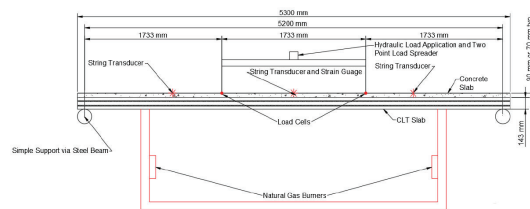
A typical TCC floor assembly test setup and mechanical instrumentation layout
